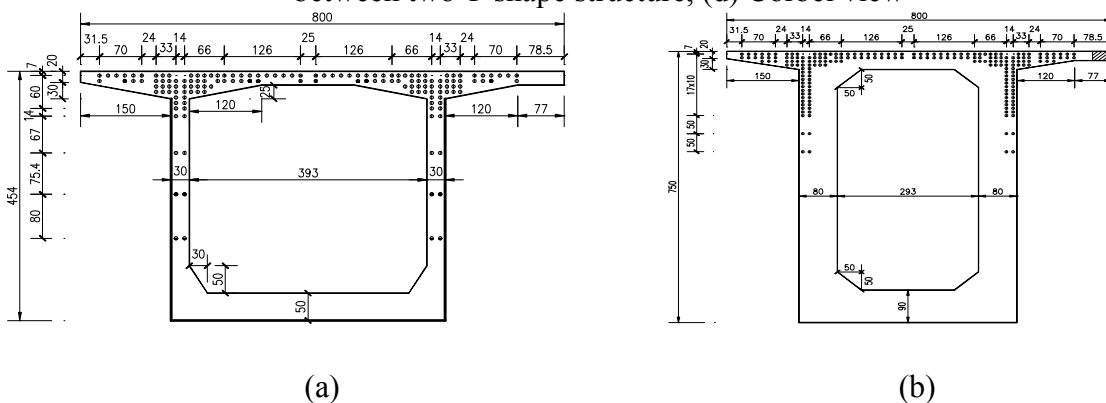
Box girder layout: (a) Pier box girder, (b) Span box girder
